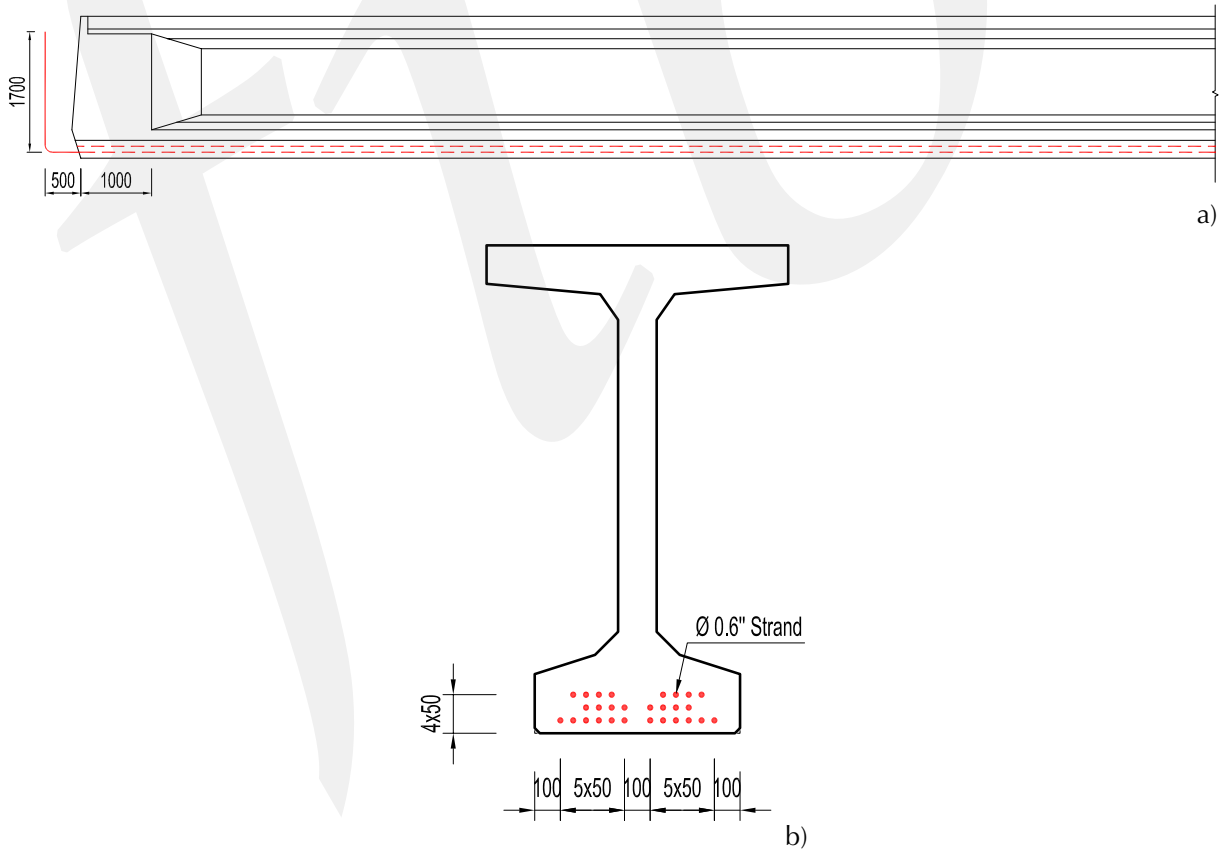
Prestressing strand layout, (a) side view, and (b) strand locations at the ends. Note: Dimensions are in centimeters. 1 cm = 0.3937 in. 1" = 1 in. = 25.4 mm.
